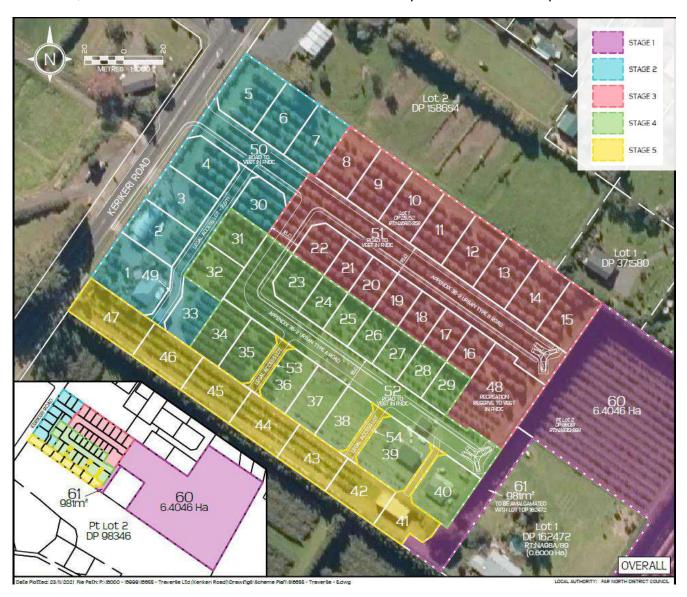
Subdivision scheme plan Rev. E (source: Reyburn & Bryant)
